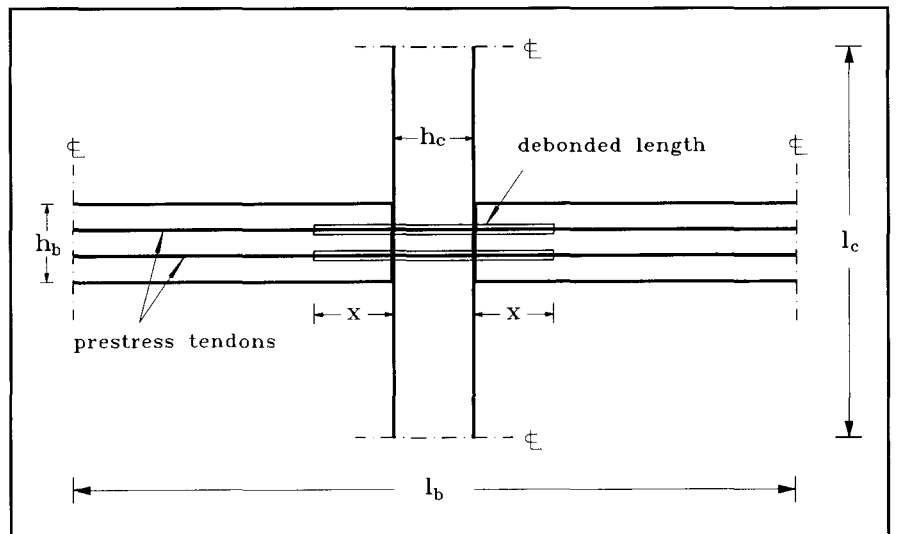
Interior precast concrete beam-to-column unit with partially debonded tendons.
